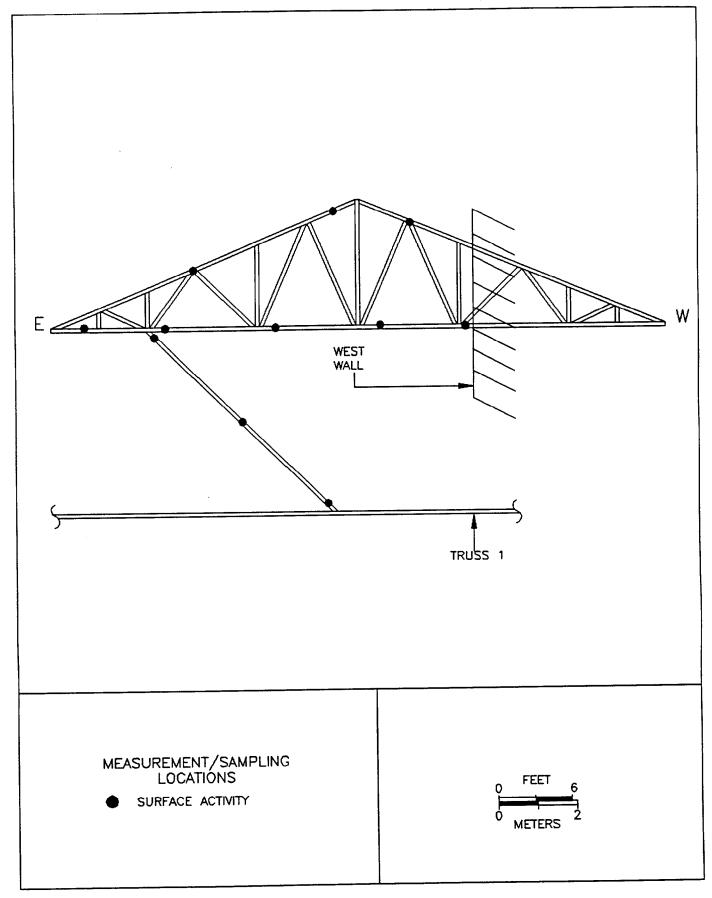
Building 8, Truss 2 — Measurement and Sampling Locations
